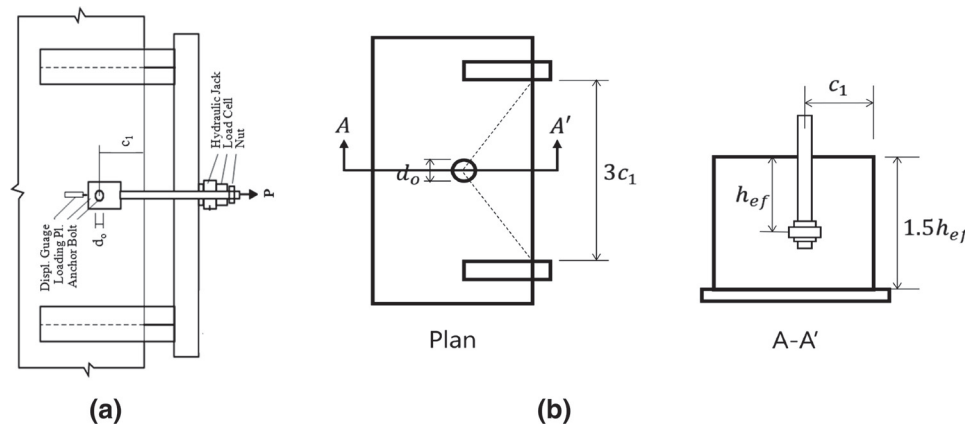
Test setup and details of specimen. a Test setup. b Details of specimen.
